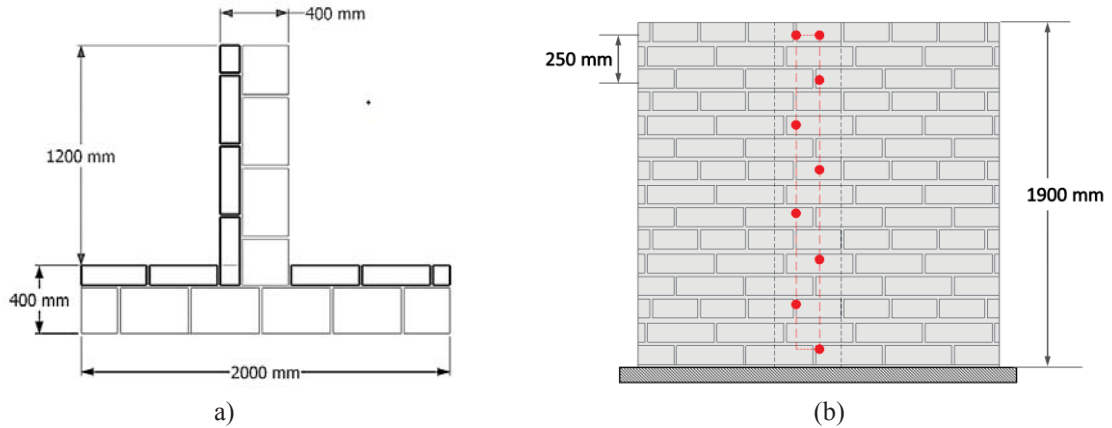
T-shaped wall tested by Maddaloni et al. [14]: (a) overall dimensions and arrangement of the unit blocks (b) layout of the strengthening system made of CFRP injected anchors.
